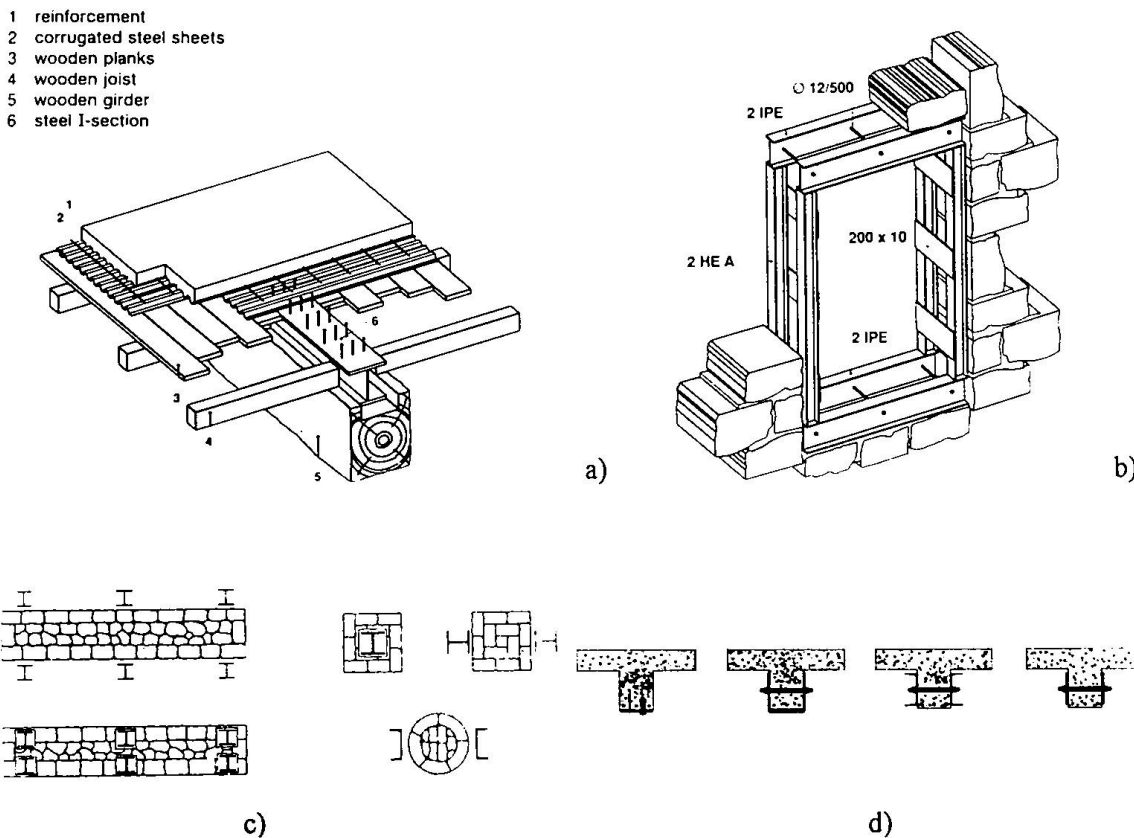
Technological systems based on composite actions, which are commonly used in consolidation operations: a) composite steel-timber floor; b) steel frame in a masonry opening; c) steel reinforcement for masonry walls and columns; d) integration of RC sections with steel plates.
